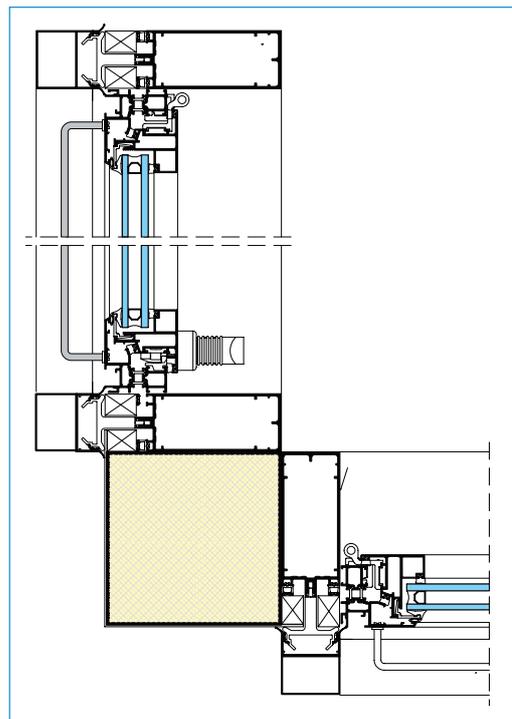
Horizontal cross-section of the corner units of the curtain wall.
